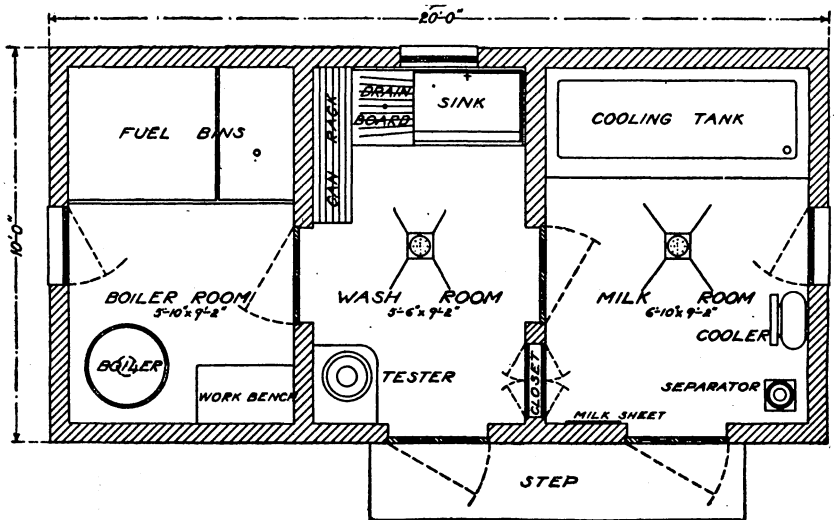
Floor plans of dairy house, showing general arrangement.
